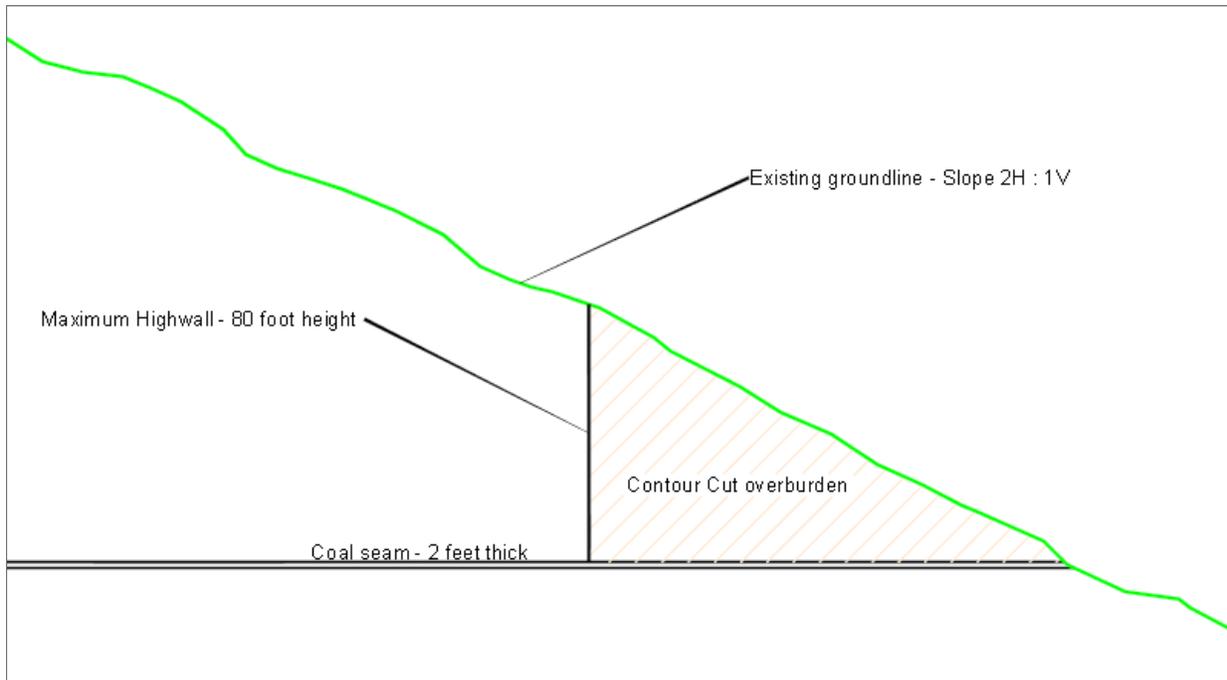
TYPICAL CONTOUR MINING CROSS-SECTION
